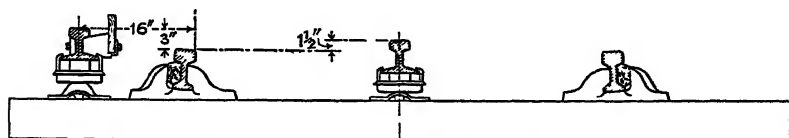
Cross Section of Track, Metropolitan District Railway.
